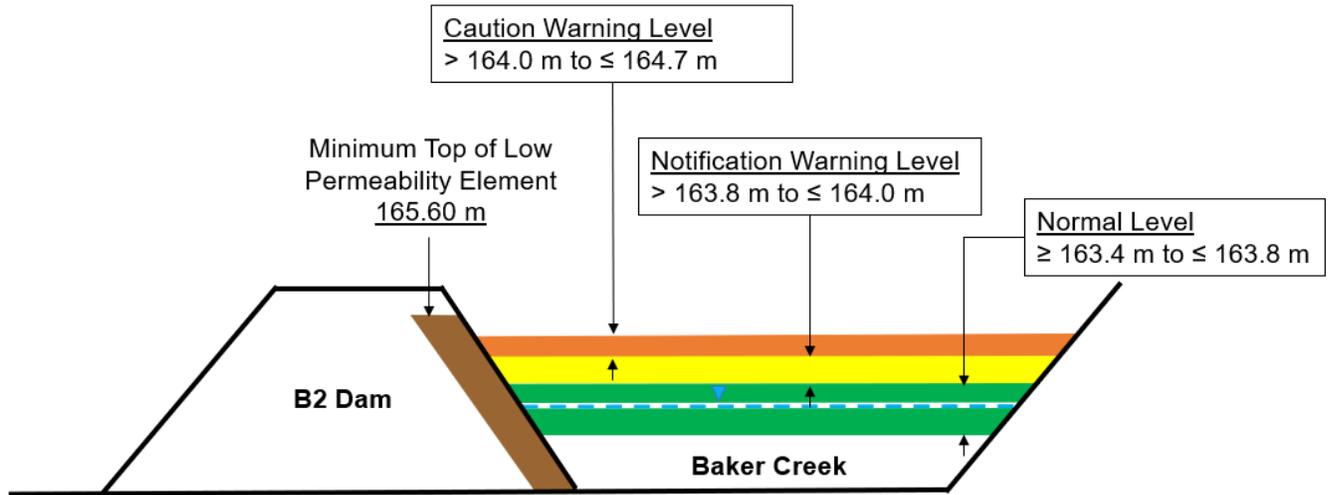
Water and Infrastructure Elevations for Baker Creek (not to scale)
